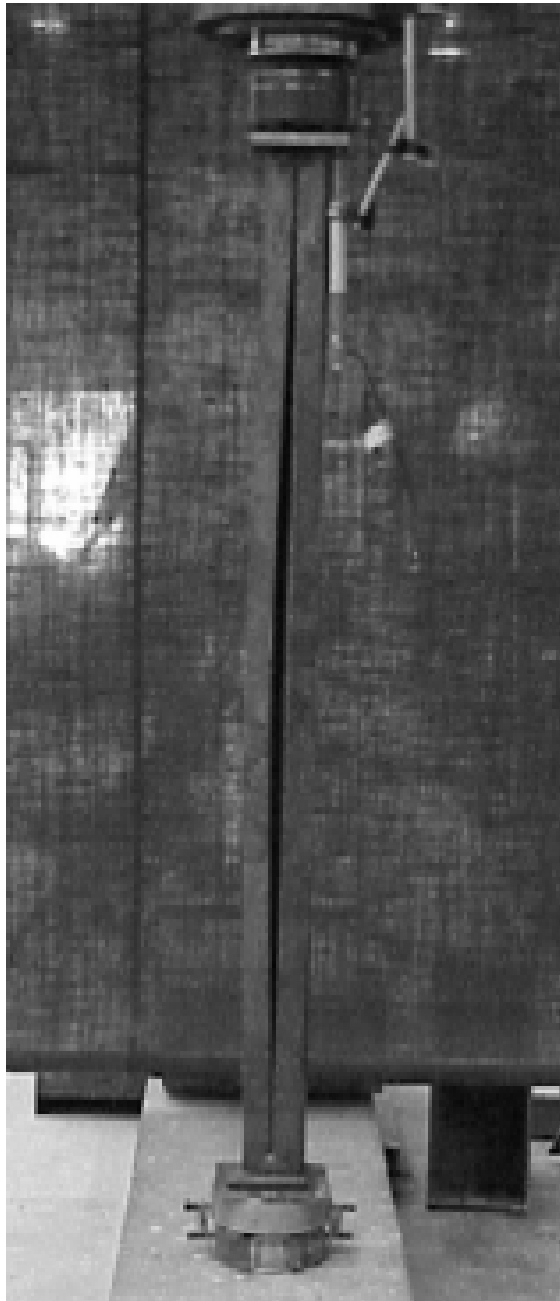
Buckling of typical specimen with no stitch welding
